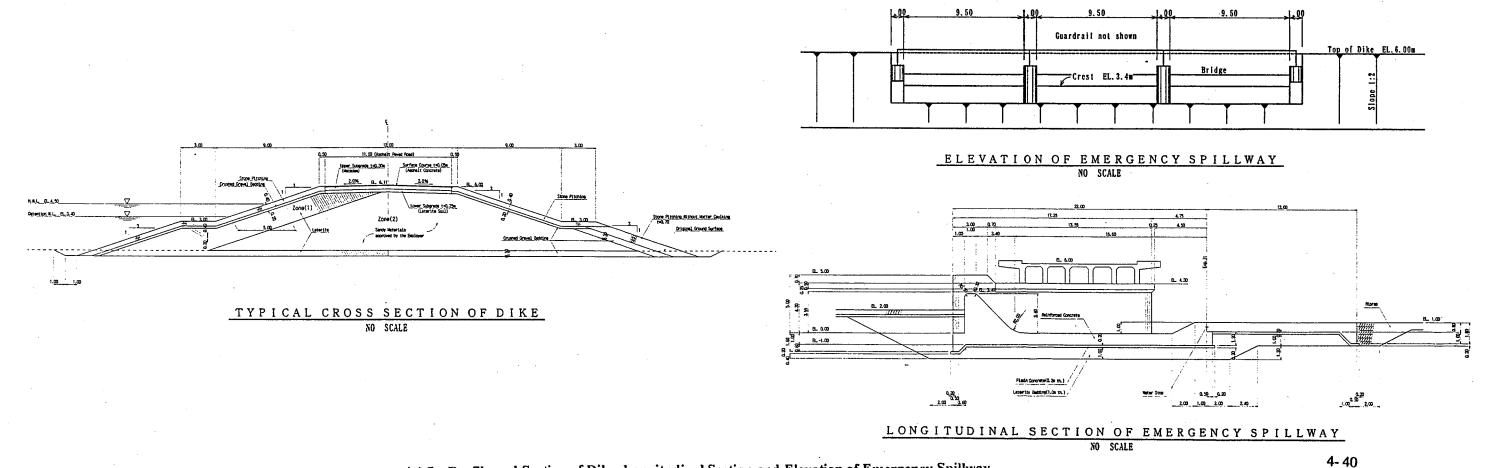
Profile and Section of Dike, Longitudinal Section and Elevation of Emergency Spillway
